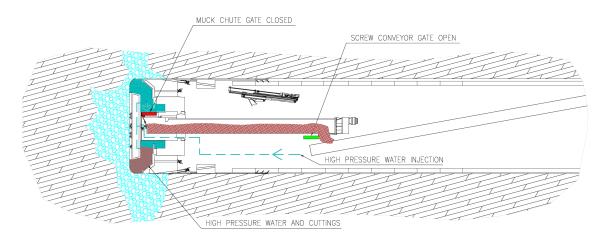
Muck chute gate is closed and water pressure is lowered, then muck is removed from the screw conveyor onto the back-up conveyor
